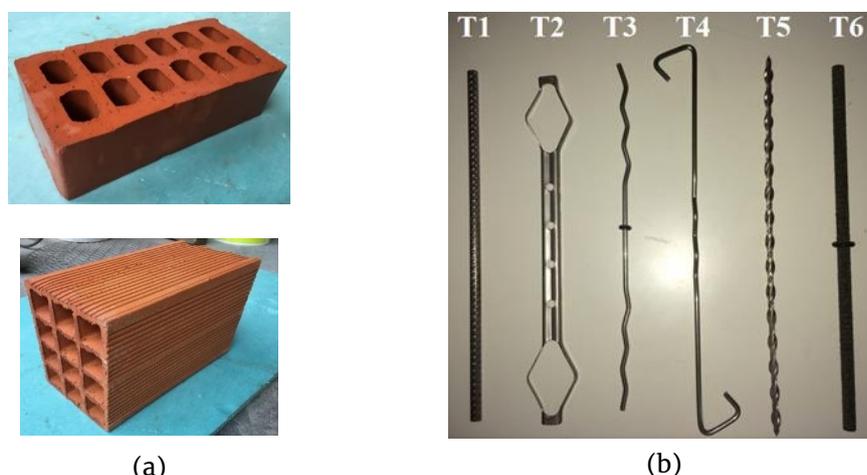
| Material used in the experimental model; (a) bricks units for masonry infill and veneer Wall; (2) wall tie typologies
